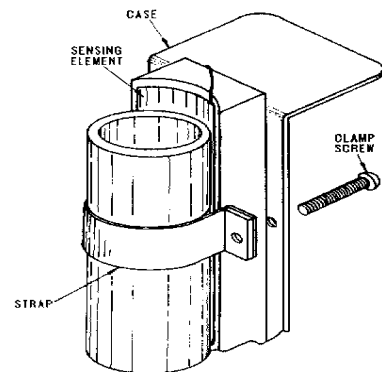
Skeleton view of control case, temperature sensing element, and mounting strap. First fasten strap to case by the clamp screw. Place control on pipe and place slot of mounting strap over tab on right side of case. Tighten clamp screw to a snug fit. Clip off or bend back excess strap outside cover of control.
